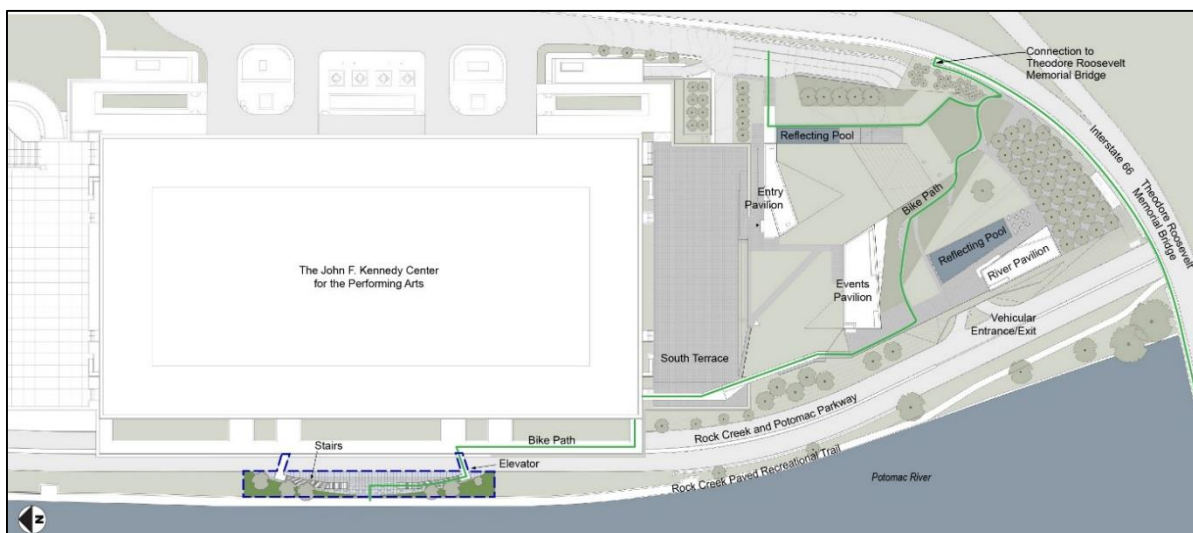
River Terrace Access Alternative, plan view (not to scale) showing the proposed bicycle route (in green) from the Rock Creek Paved Recreation Trail through the site of the Expansion Project.
